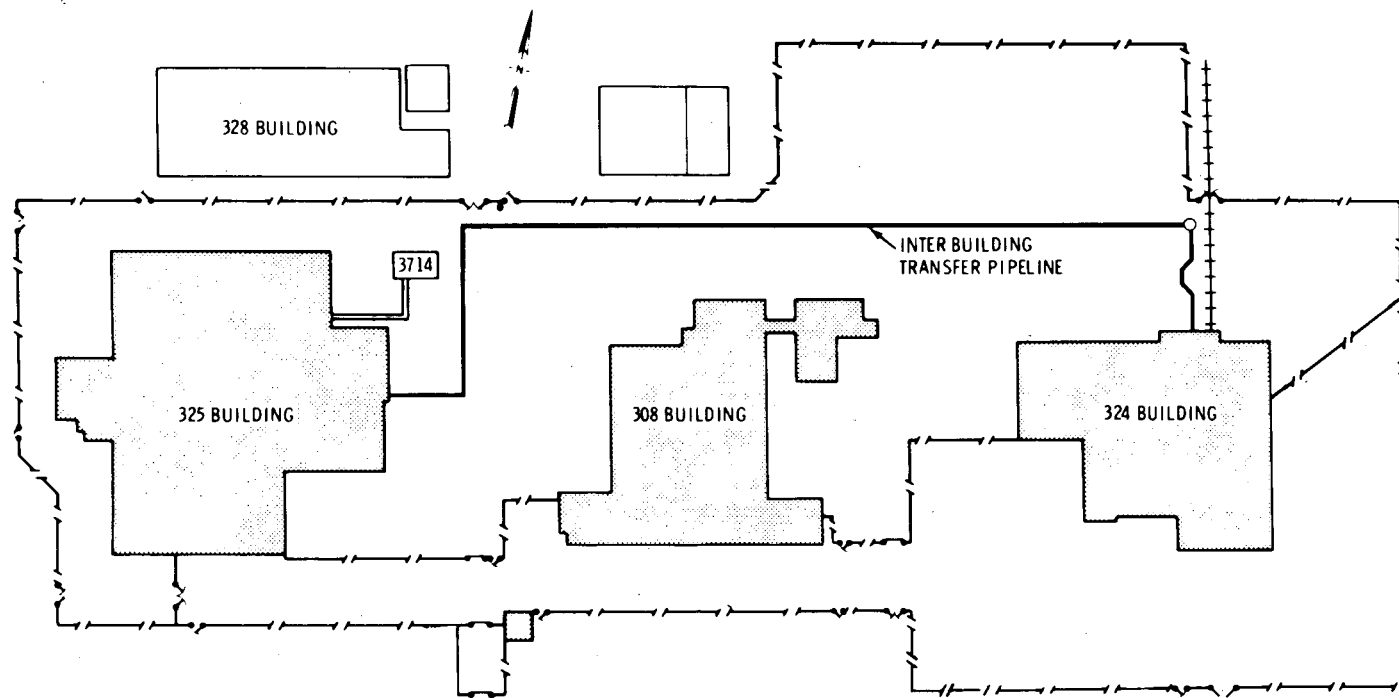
Plot Plan for Buildings 324 and 325
